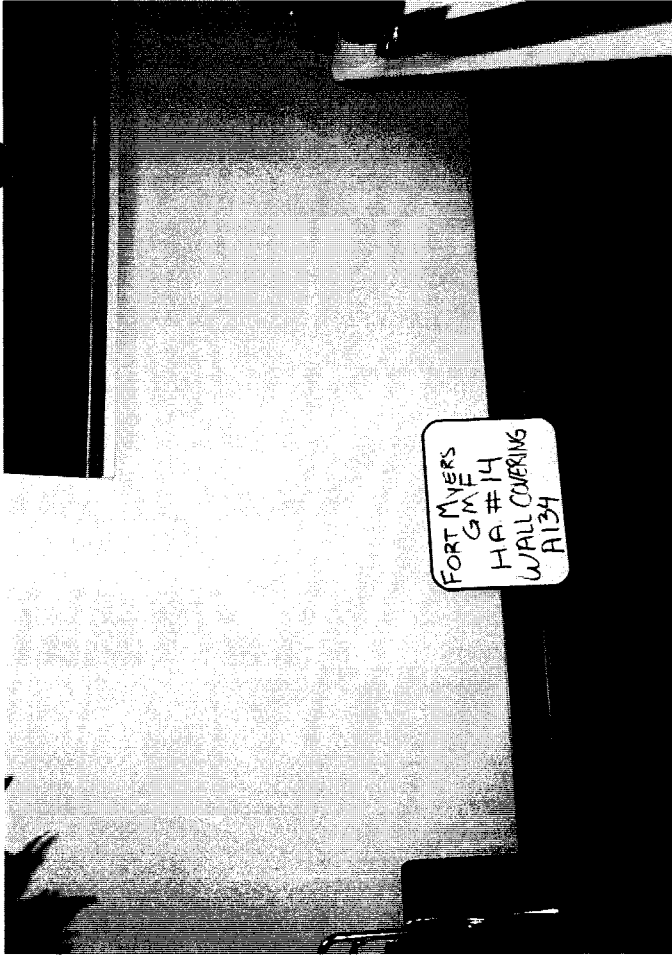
Homogeneous Area 14: Wall covering, as found in room A-134 (non-ACBM)
